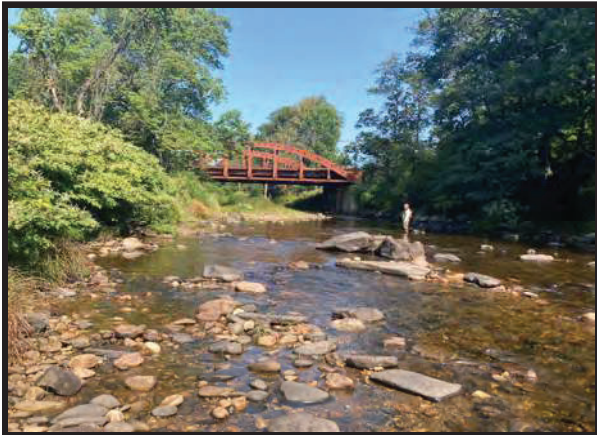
View facing upstream showing the existing bridge C-09-013. Note the Japanese knotweed along the banks. *Photo taken September 9, 2022
